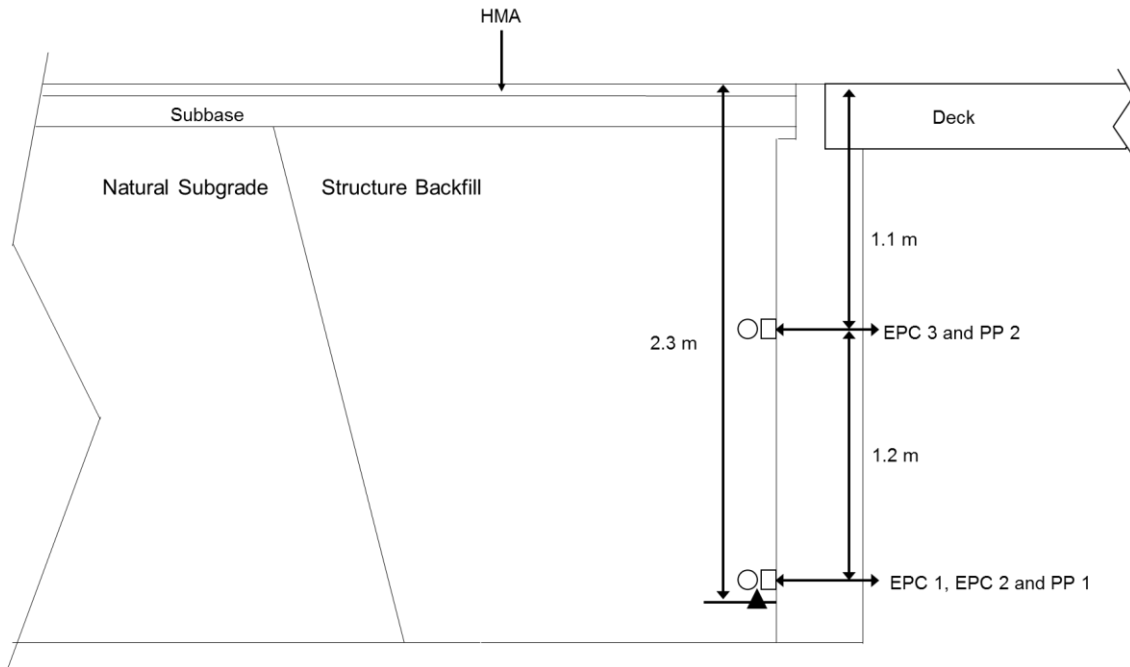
Cross-sectional view of the bridge abutment showing EPC and PP sensor locations at Hobbles Creek Bridge
